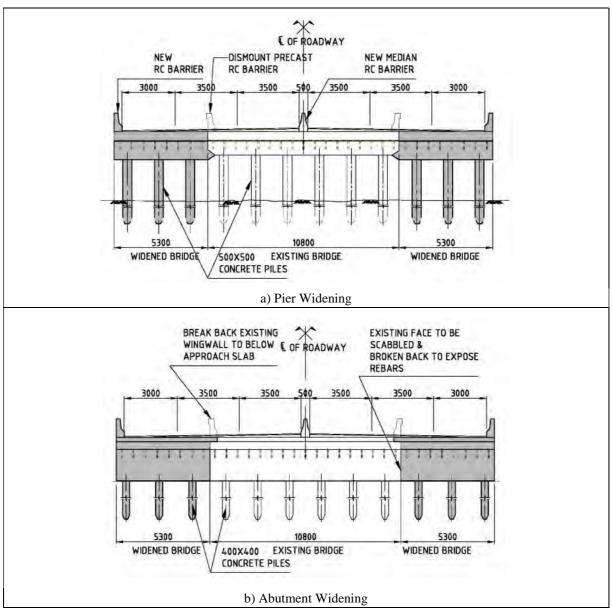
Typical Cross-Section of Substructure Widening for Full 4-Lane
